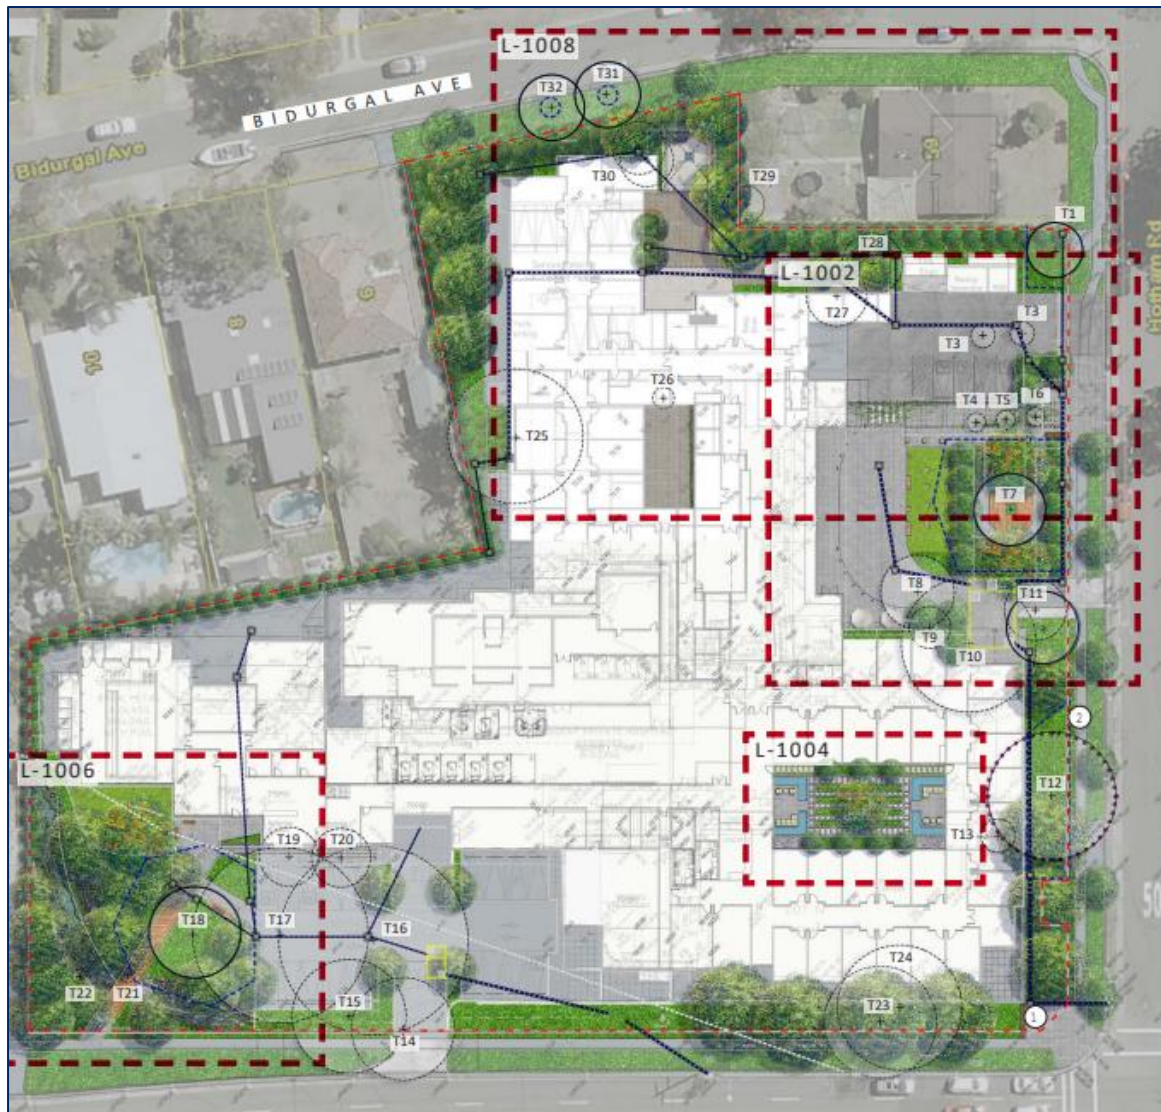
| Landscape concept masterplan (Source: Applicant's RtS)
